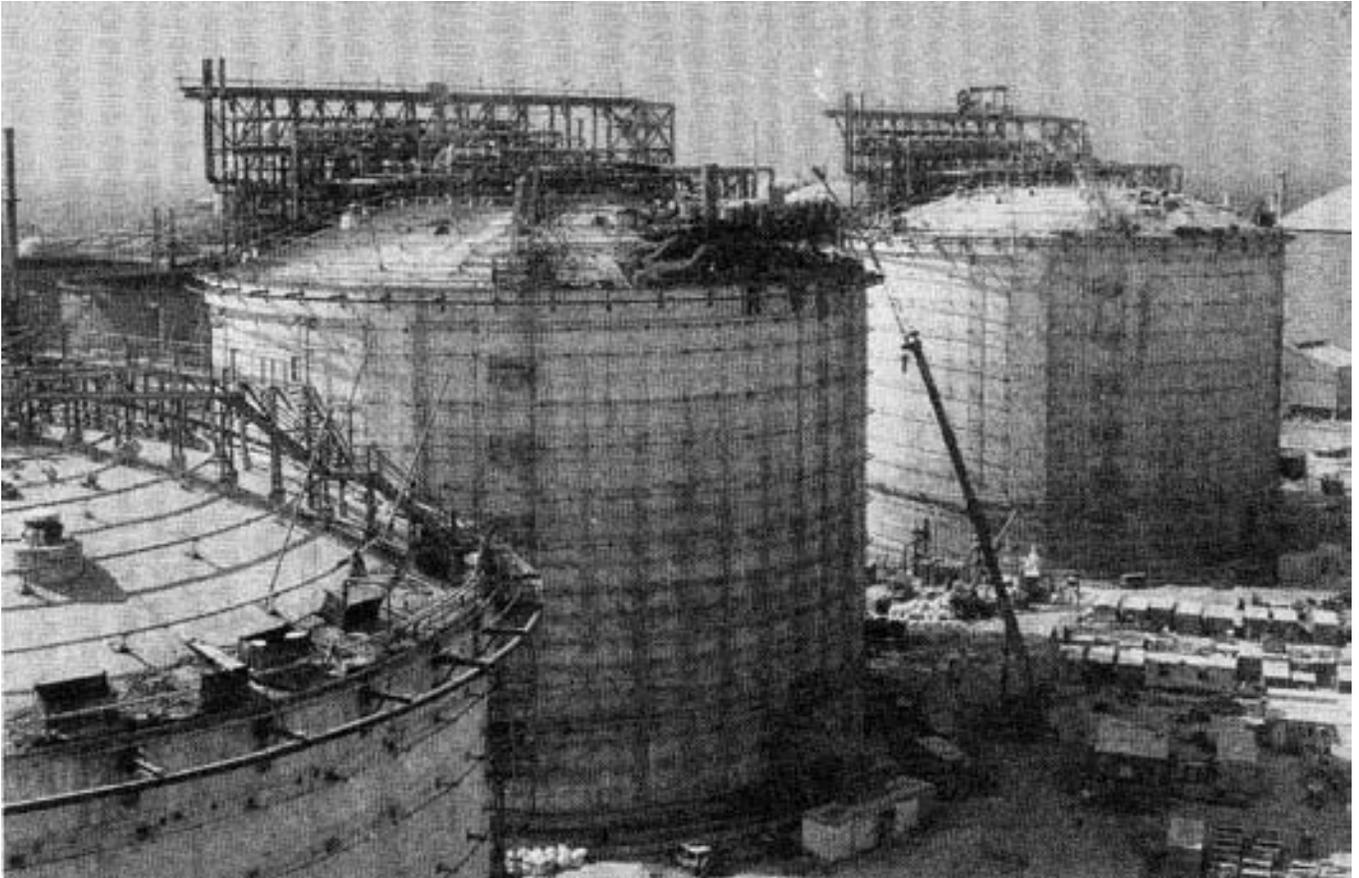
Figure O Double containment 80,000 cubic metre LNG tanks under construction, Das Island, Abu Dhabi Gas Liquefaction Co.
